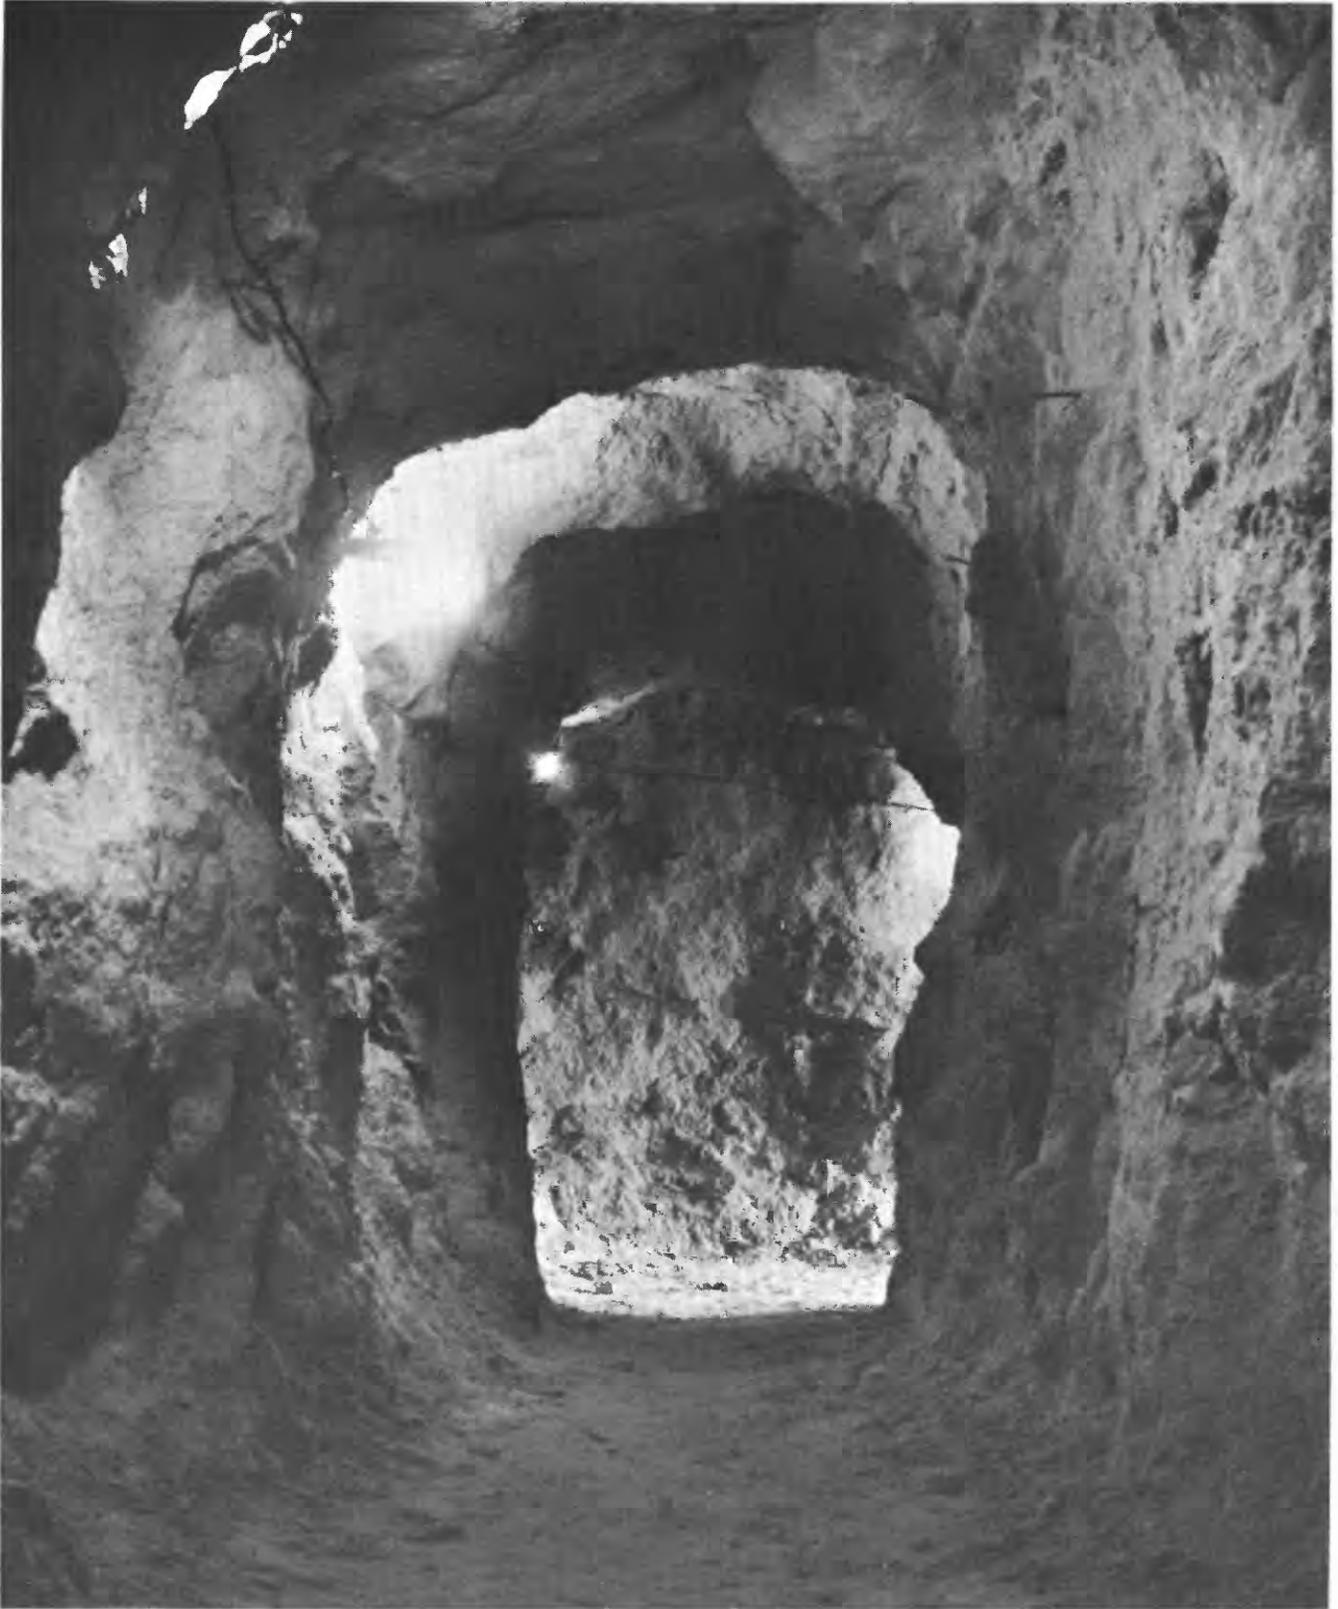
USGS Tunnel viewed from room B toward station 4+50 showing excellent rock and tunnel conditions before high-explosive tests.
